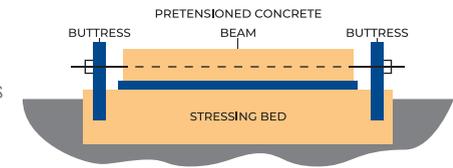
Pre-Tensioned Concrete Stressing Set-Up
